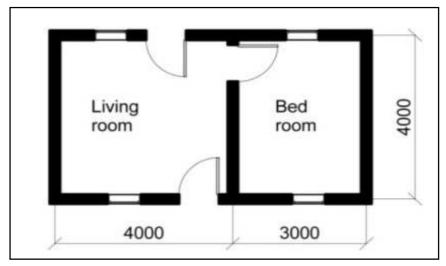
Floor Plan of Colonial Igala Two Rooms Husband's House. Source: Field Survey (2017).
